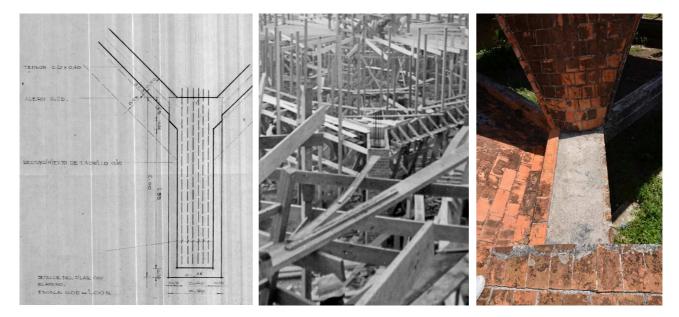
On the left, the original design of the concrete block located at the top of the pillars (ISA archive). In the middle, a picture from the construction site showing some iron bars jutting from the pillar (ISA archive). On the right, a recent picture of the top of the pillars. Notice that, once again, the external layer of bricks acted as a formwork for the concrete.
